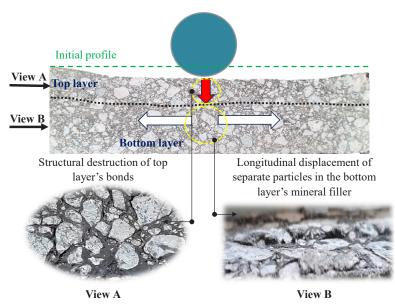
Schematic showing the formation of rutting in the structural layers of an asphalt concrete coating
